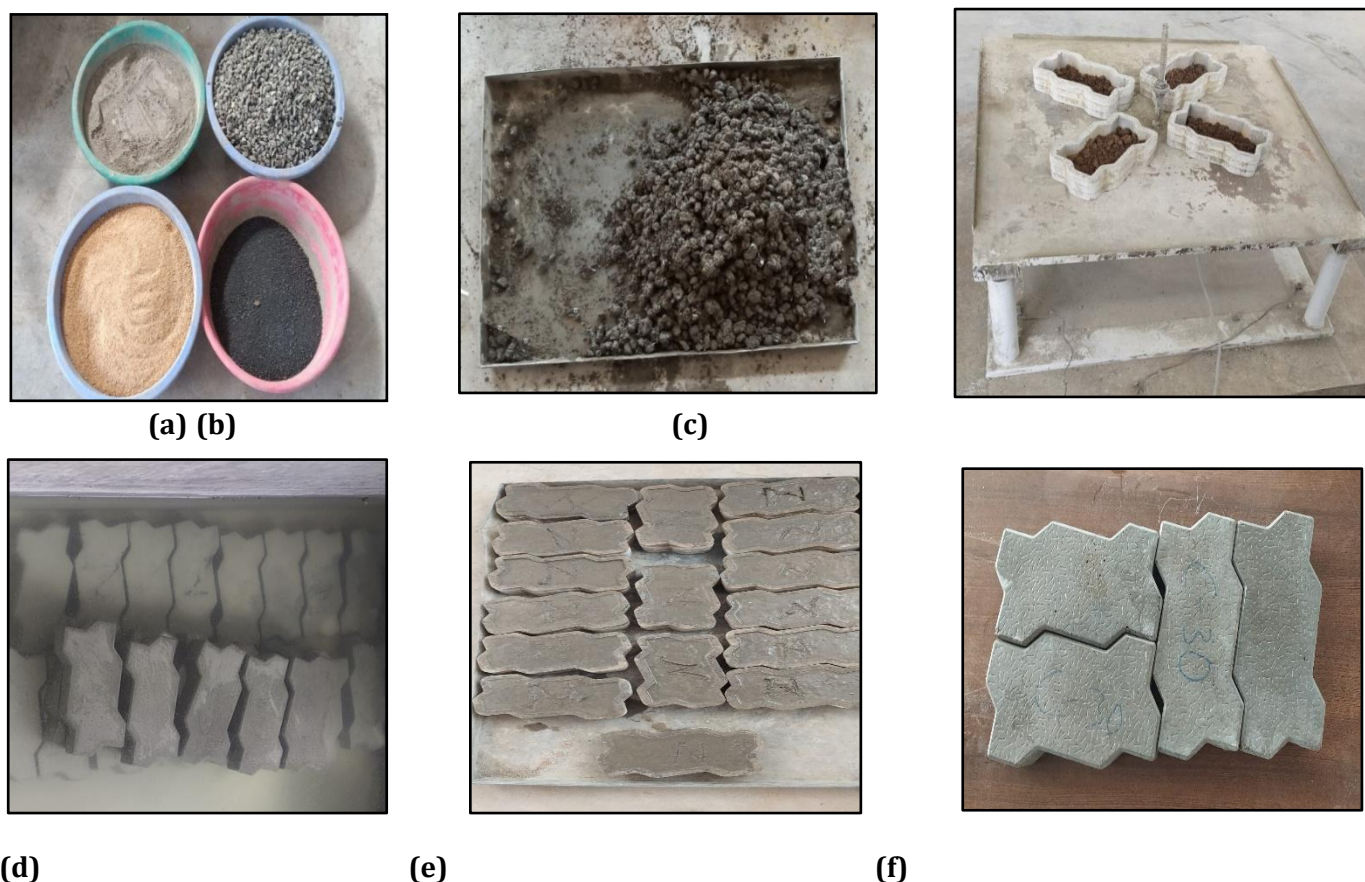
Casting Process of Paver block specimens (a) Materials for casting specimens (b) Mixing of raw materials (c) Table vibrator for compaction (d) Curing of specimens (e) Paver block specimens before demoulding (f) Paver block specimens after demoulding
